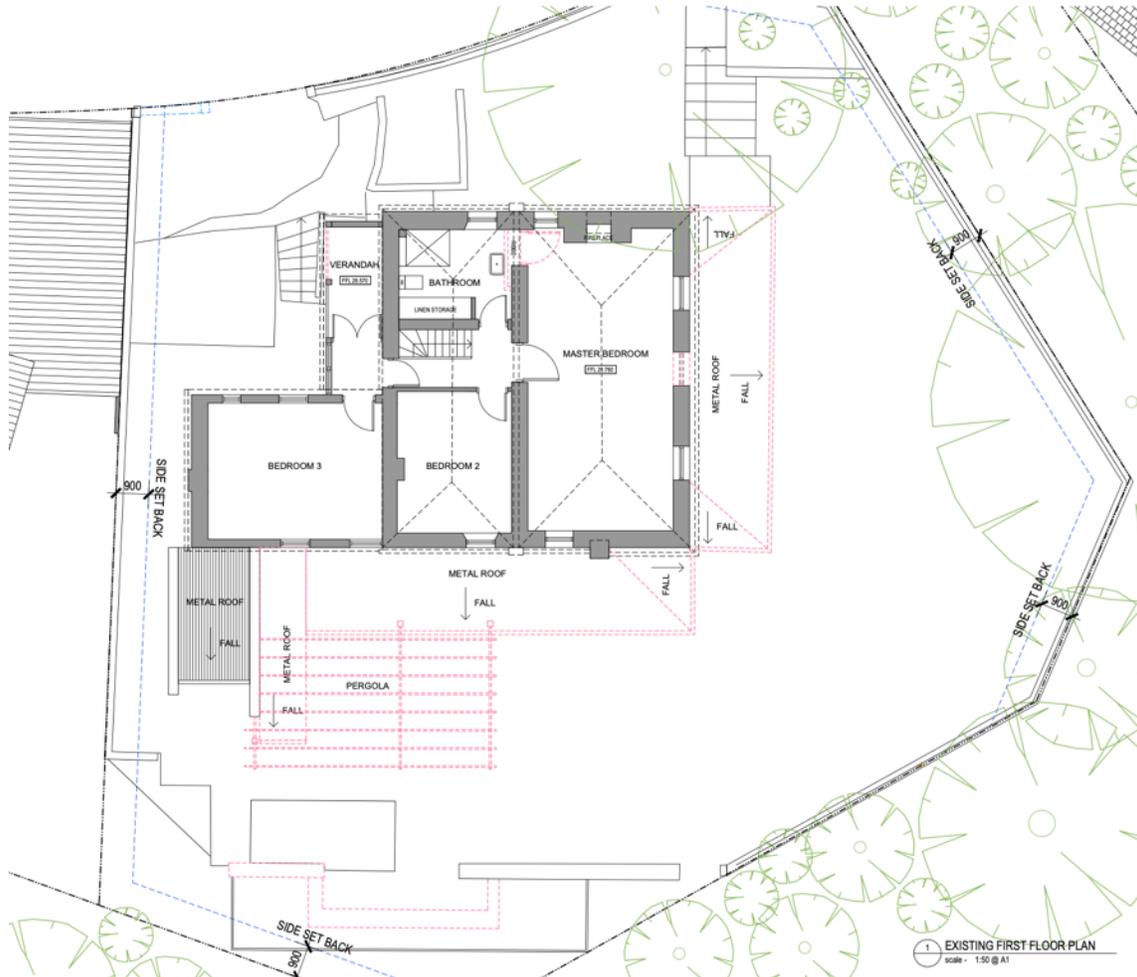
, Existing First Floor and Demolition Plan, Michael Cumming Architect, 24.02.23
